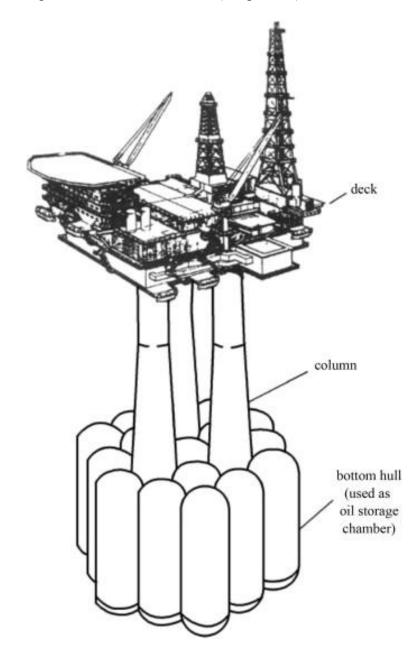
An example of a concrete gravity-based structure. (Fang and Duan, 2014)
